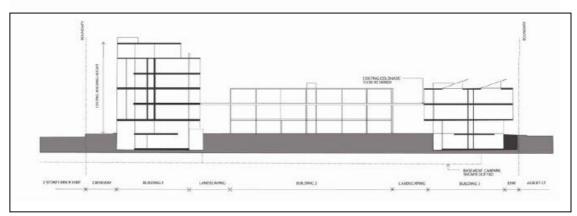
Section through Buildings 1, 2 and 3 of approved concept plan
